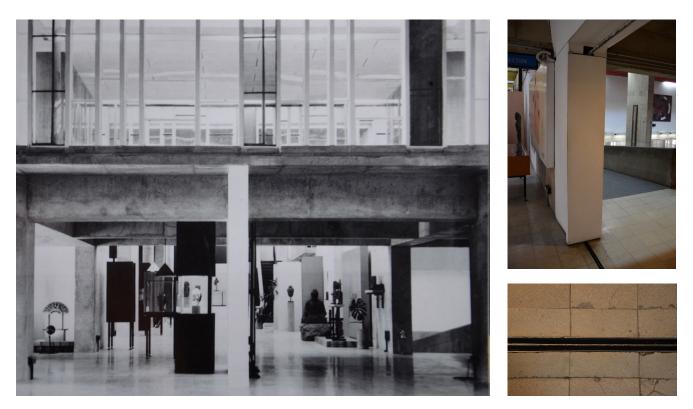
Addition of collapsible grill at opening to gallery. Channel fixed onto original flooring.
